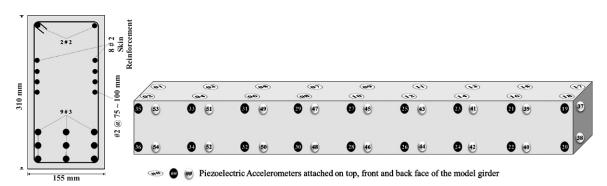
Model girder cross-section and Piezoelectric Accelerometers arrangement
